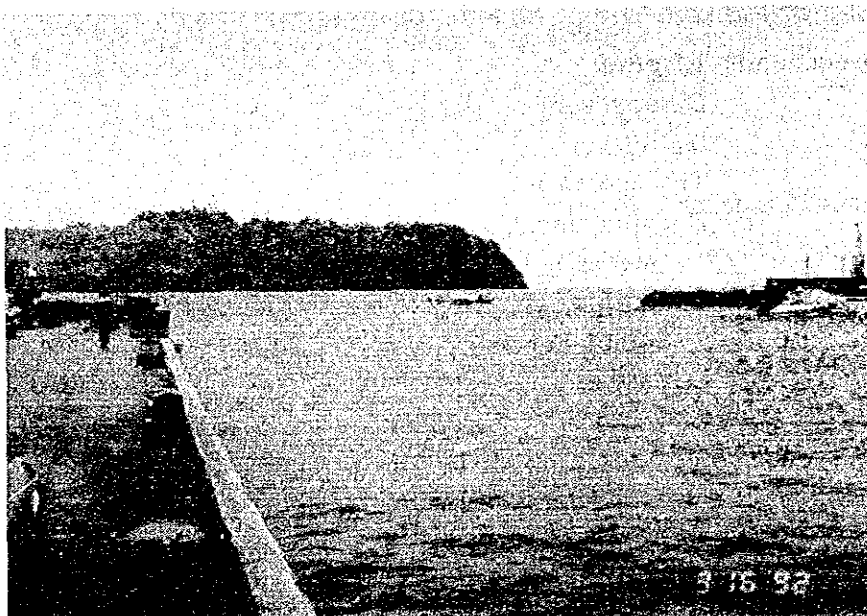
Ro/Ro Terminal Site of Port of Iloilo(2)
